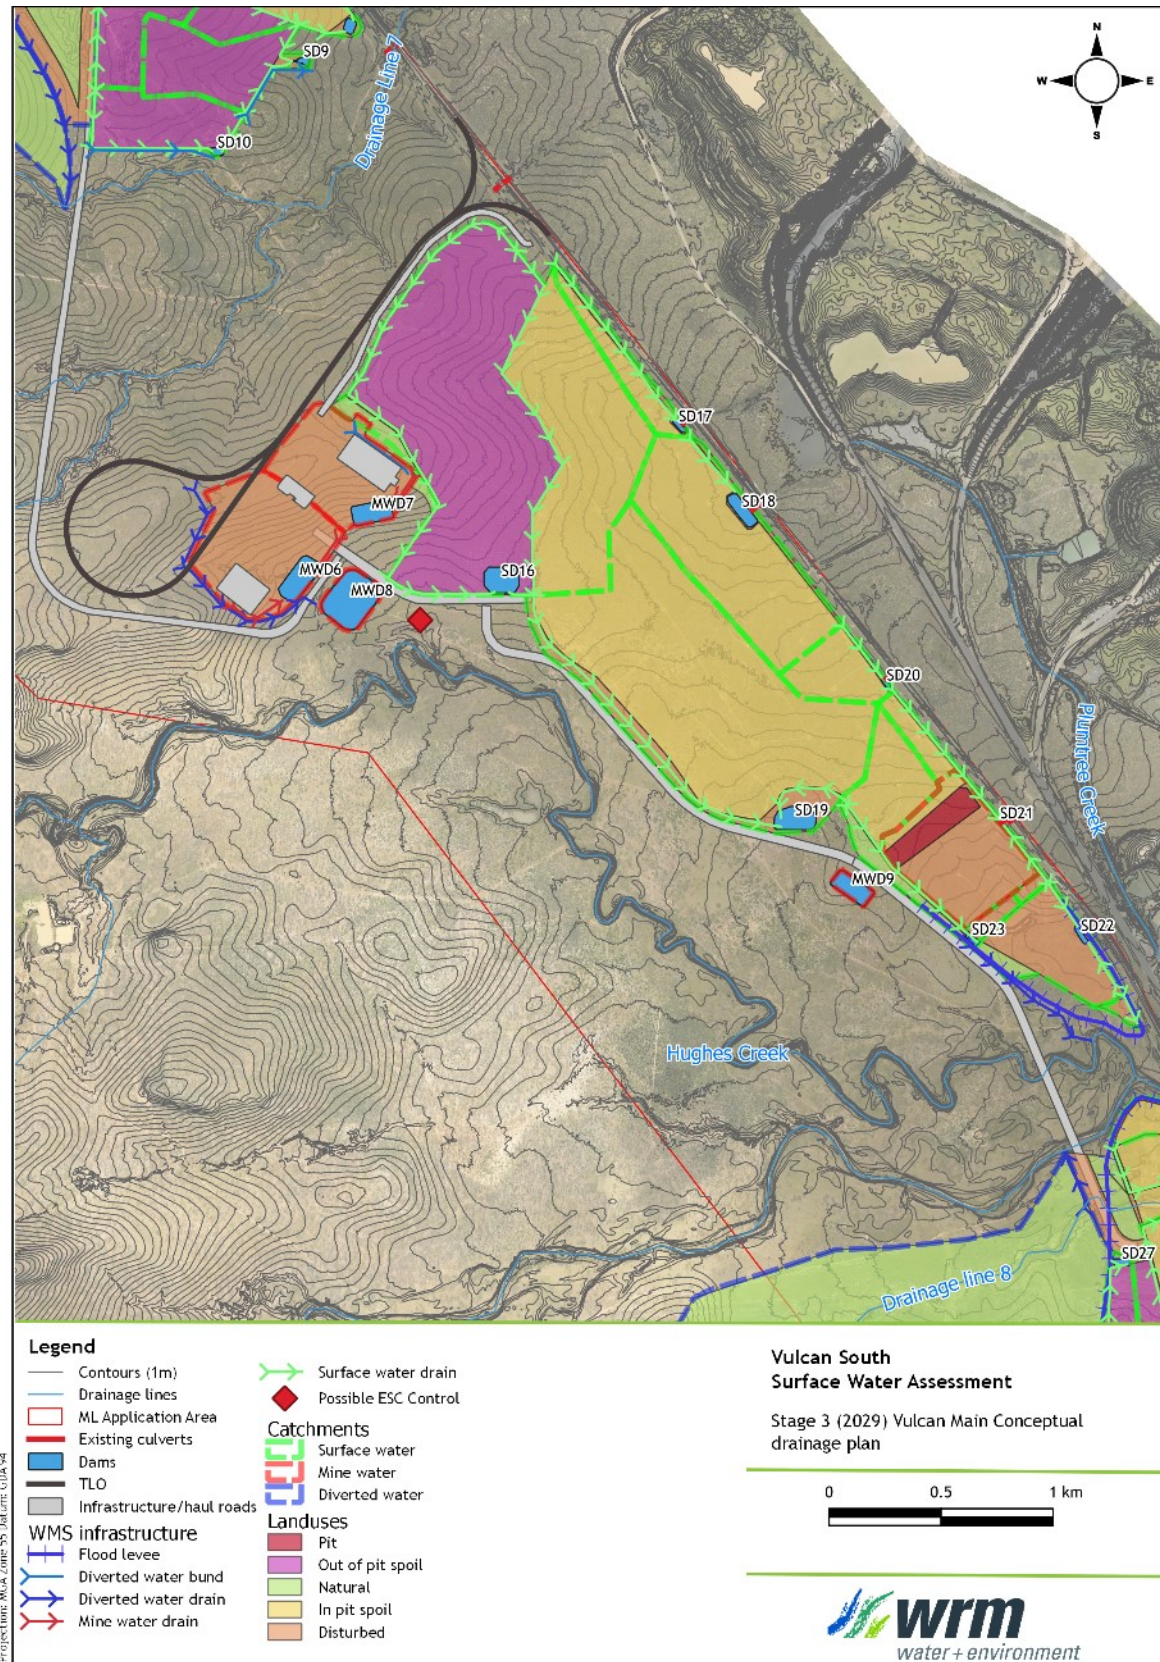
Stage 3 (Year 2029) Vulcan Main mining area conceptual drainage plan
